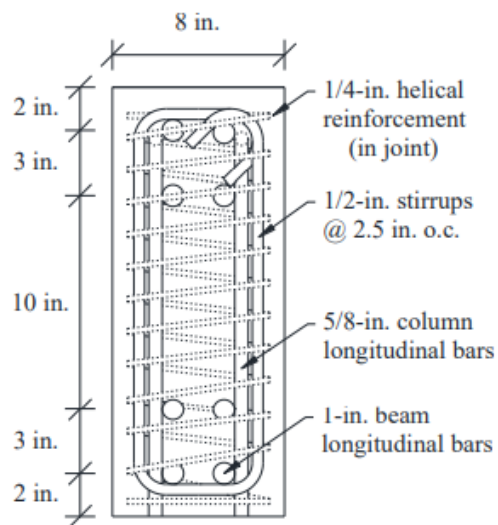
Beam Cross Section and Typical Reinforcement (Monical, 2022, Figure B-7)
